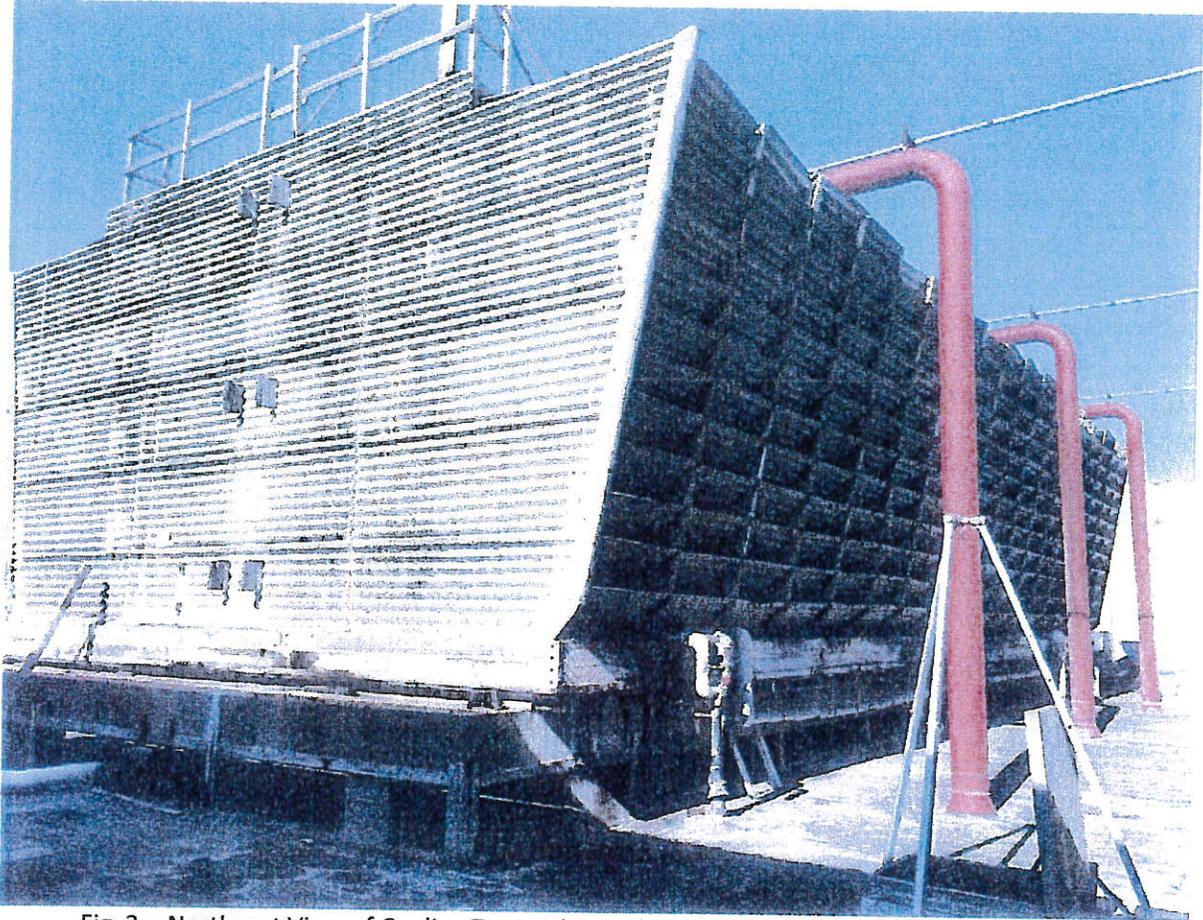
Northeast View of Cooling Towers located on the Medical School Power Plant roof.
